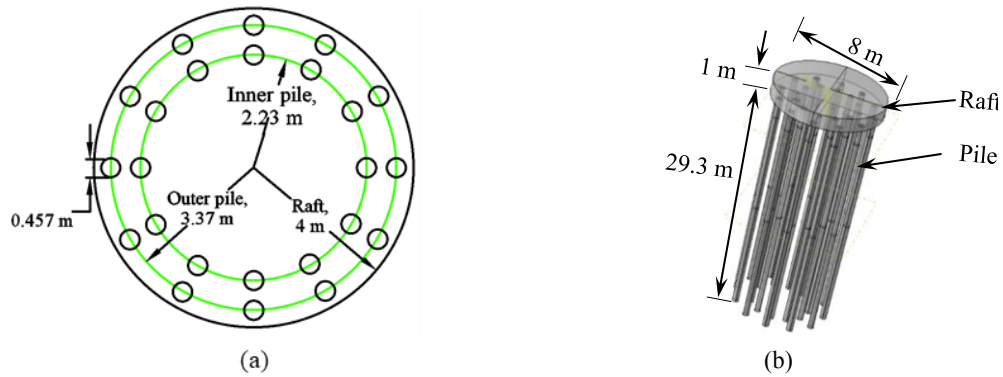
Arrangement of piles in piled-raft foundation (a) plan view and (b) 3D view
